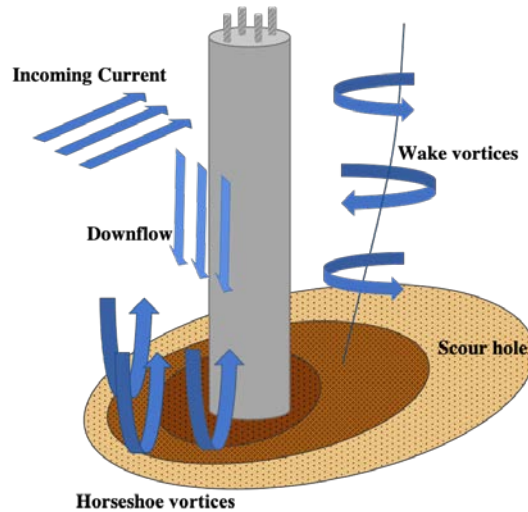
Local scour near bridges occurs due to the obstruction in flow caused by the bridge pier. Sediment is eroded by vortices near the base of the pier and leaves the superstructure vulnerable to damage or failure.
